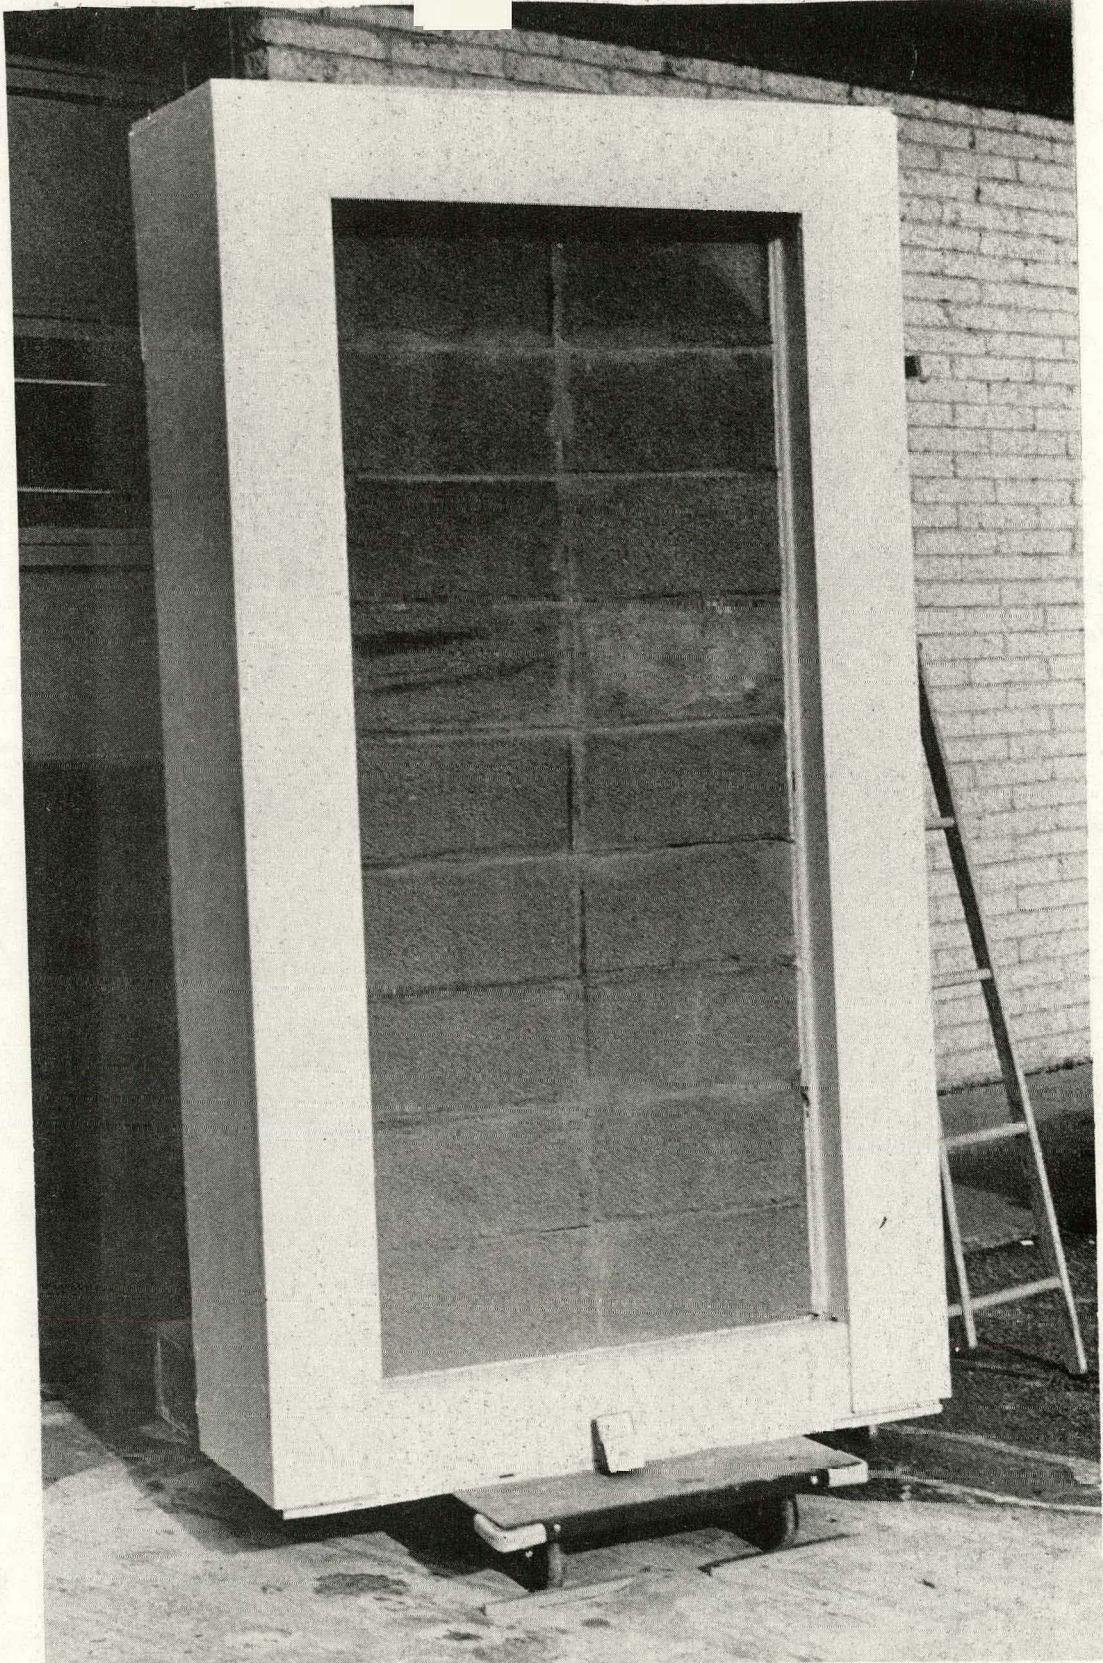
A test section of a conventional block wall with simple glazing. In this photo the blocks have not yet received a selective coating.
